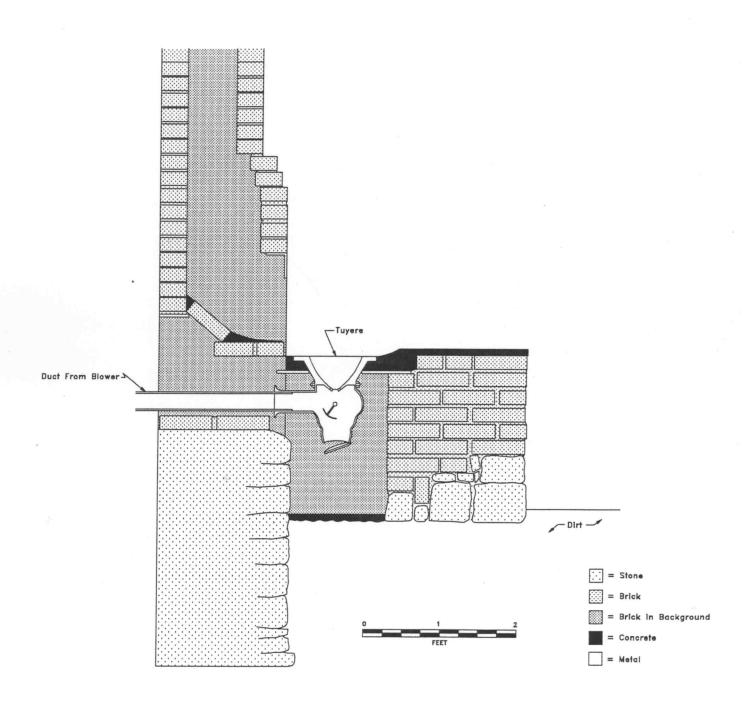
Sectional detail of Baumbauer Blacksmith Shop hearth, 1995.
